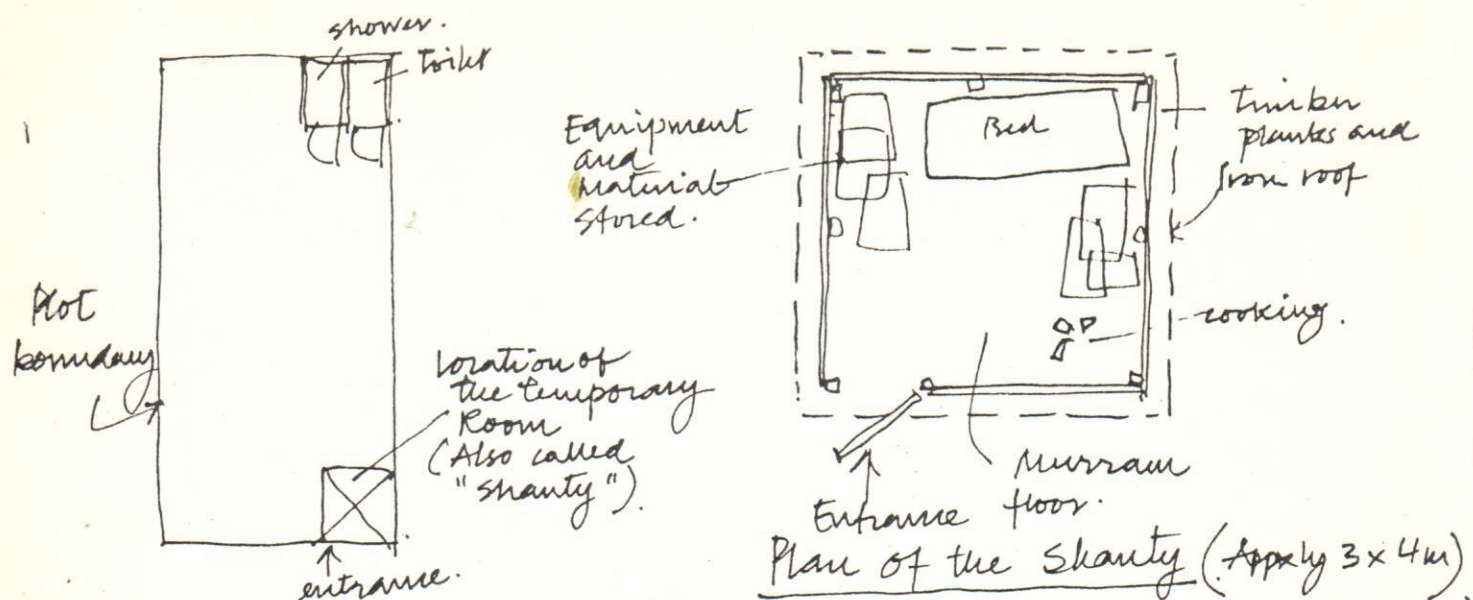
TWO TYPICAL LAYOUTS OF TEMPORARY DWELLINGS
